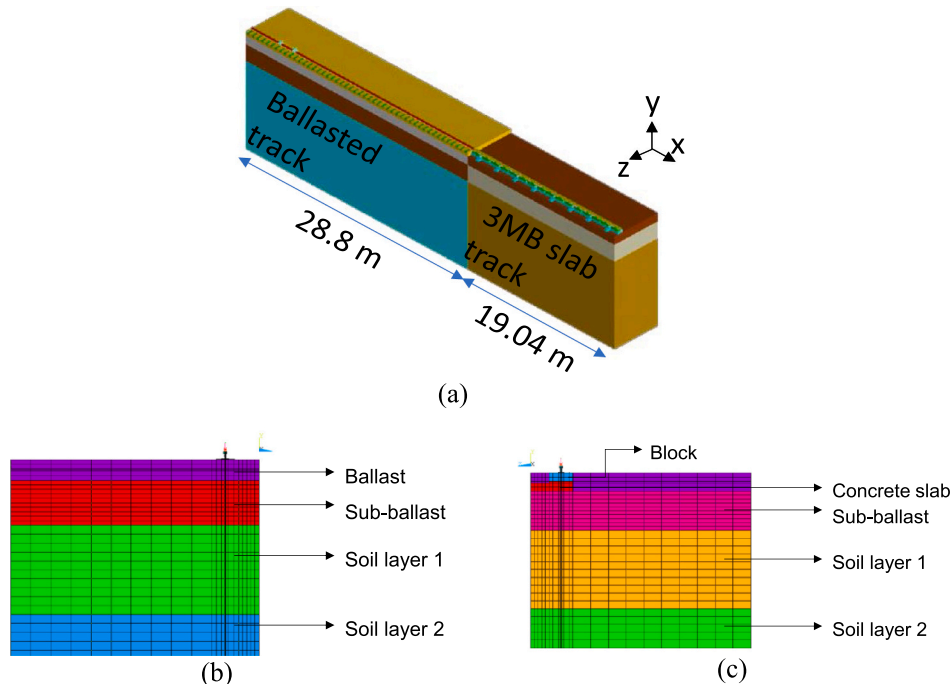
Sketch of 3D transition zone model: a) General overview of the model, b) cross-section on ballasted track side, c) cross-section on slab track side.
